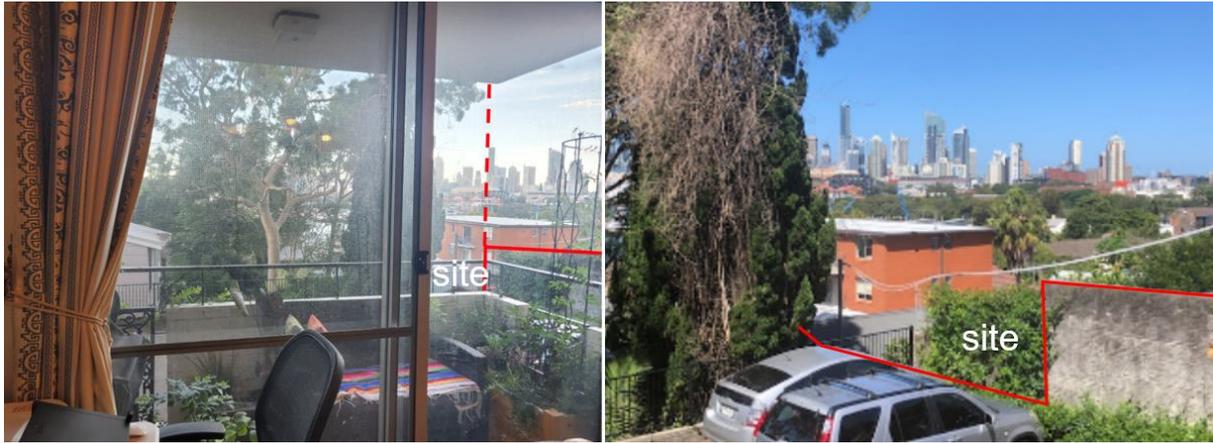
View from study and balcony (standing) of first floor apartment (resident supplied). Roof of studio addition within subject site can be seen in both images.
